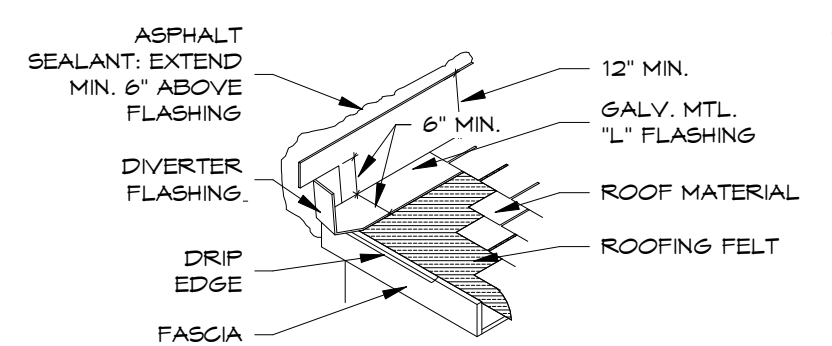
FLASHING INSTALLATION AT KNEEWALL. (SEE FIGURE 3 FOR MORE INFO)
